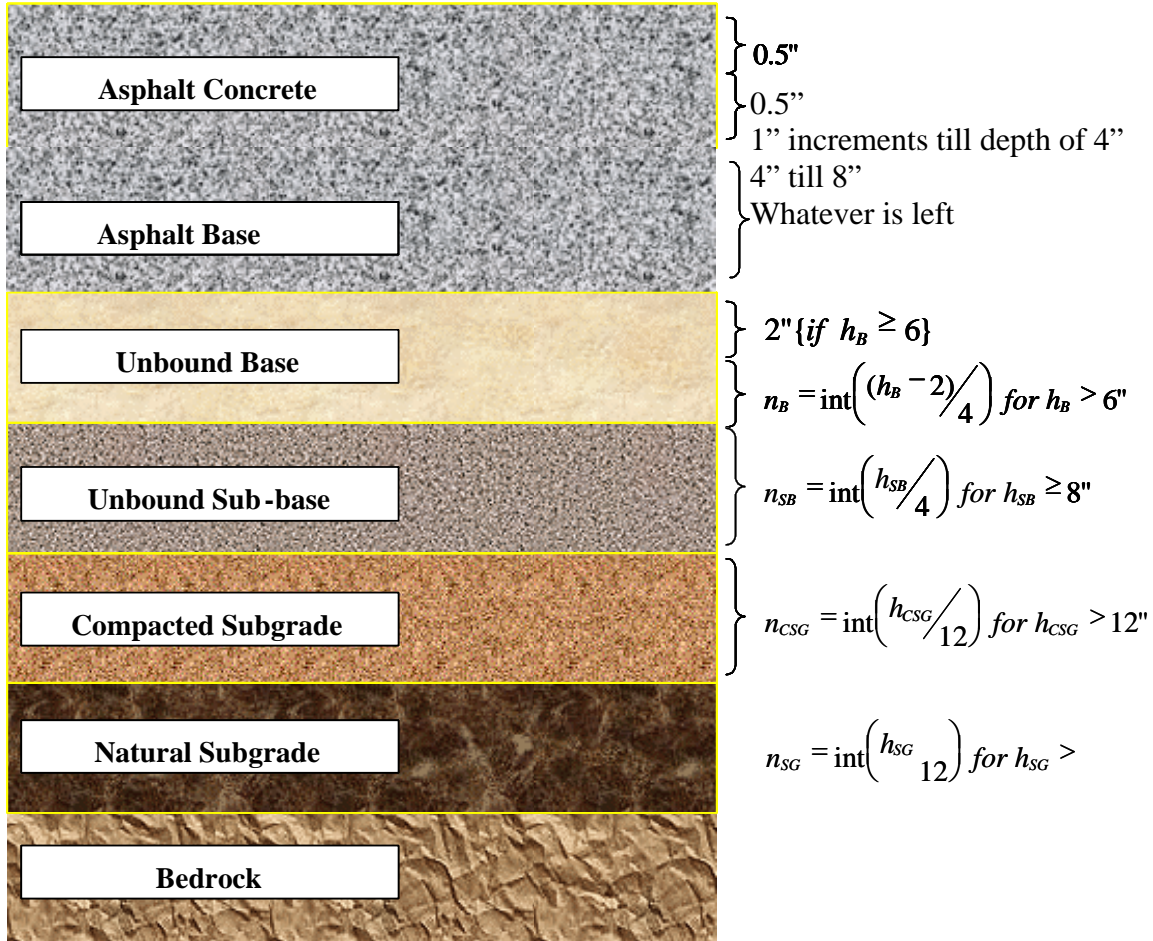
Layered pavement cross-section for flexible pavement systems (no sub-layering beyond 8 feet).
